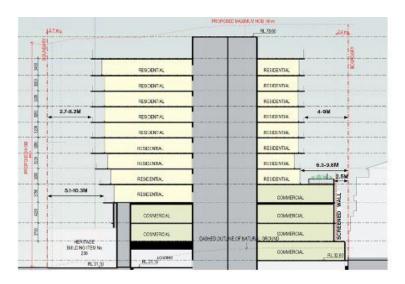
Indicative development concept for a 12 storey mixed use building (Source: Planning Proposal Concept Report, Group GSA 2021)
